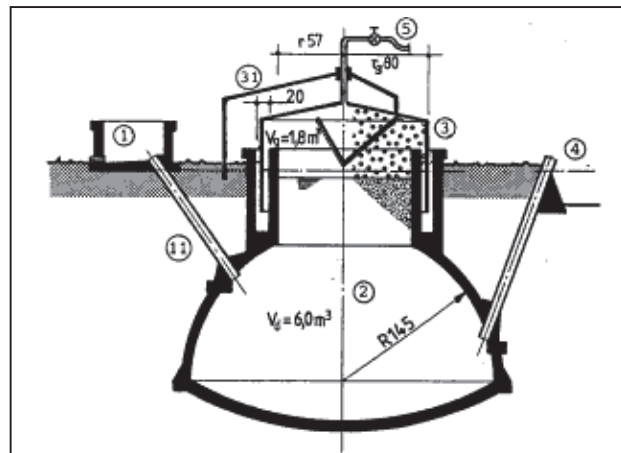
Water-jacket plant with external guide frame. 1 Mixing pit, 11 Fill pipe, 2 Digester, 3 Gasholder, 31 Guide frame, 4 Slurry store, 5 Gas pipe
